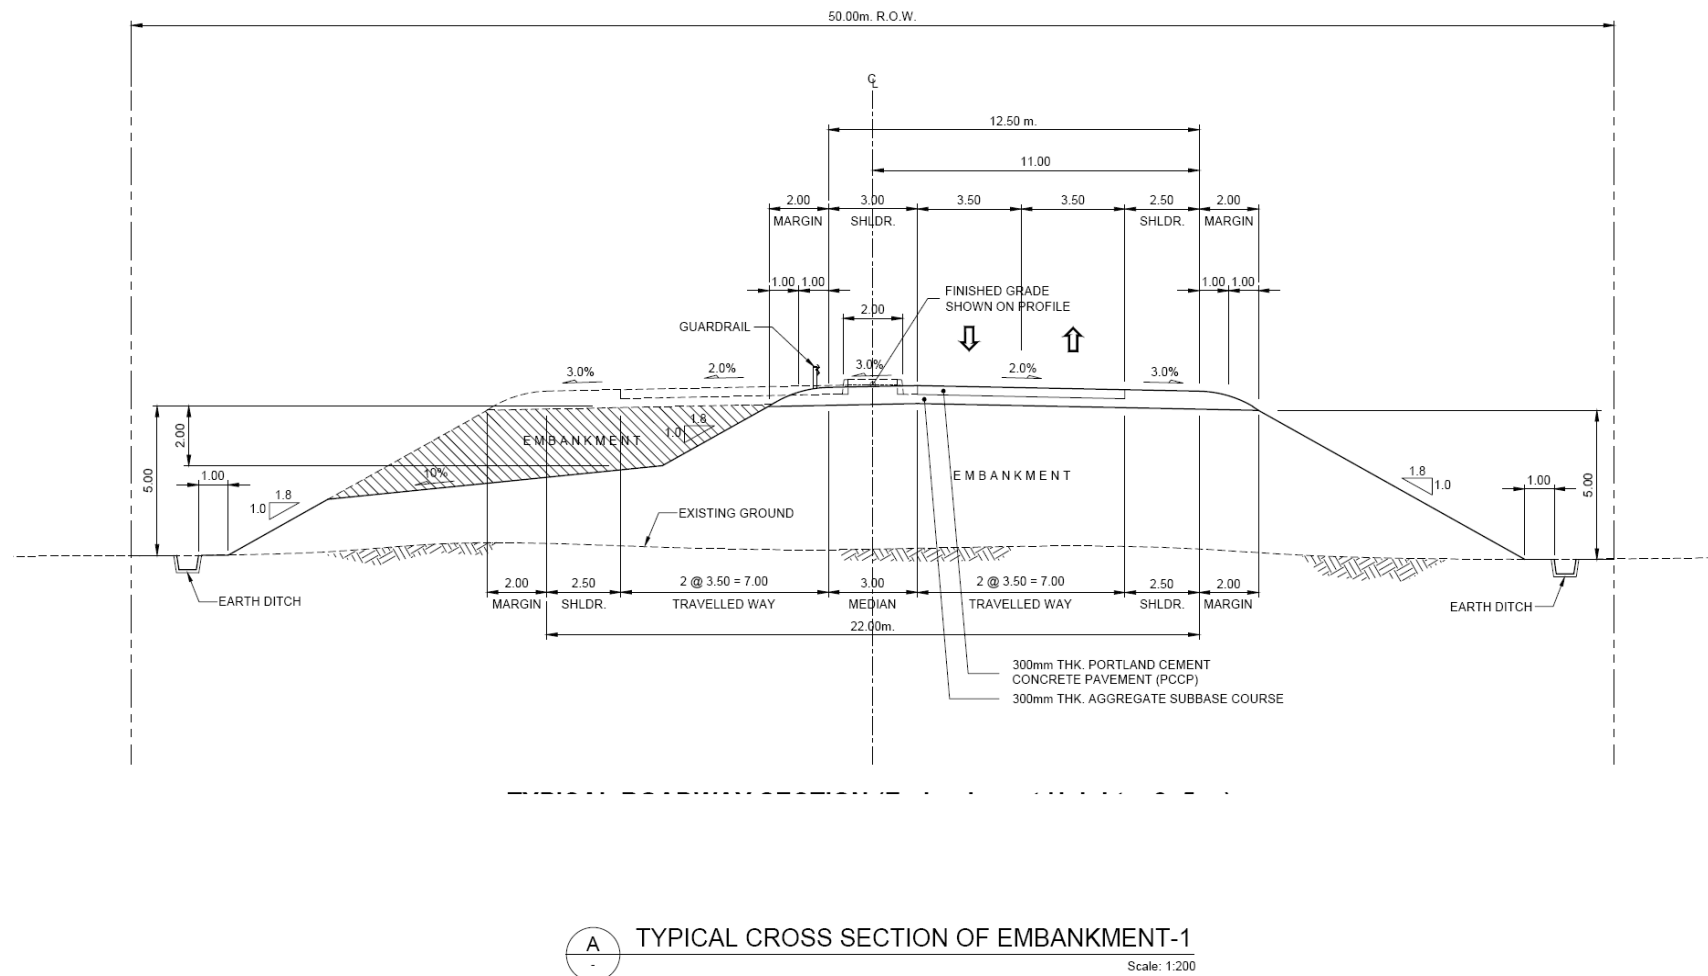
(3) TYPECAL ROADWAY CROSS SECTION EMBANKMENT-1
